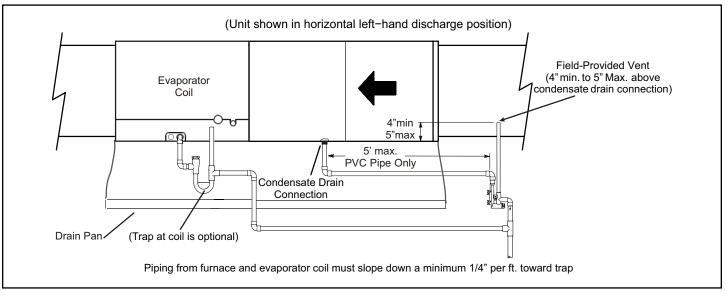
Furnace with Evaporator Coil Using a Common Drain
